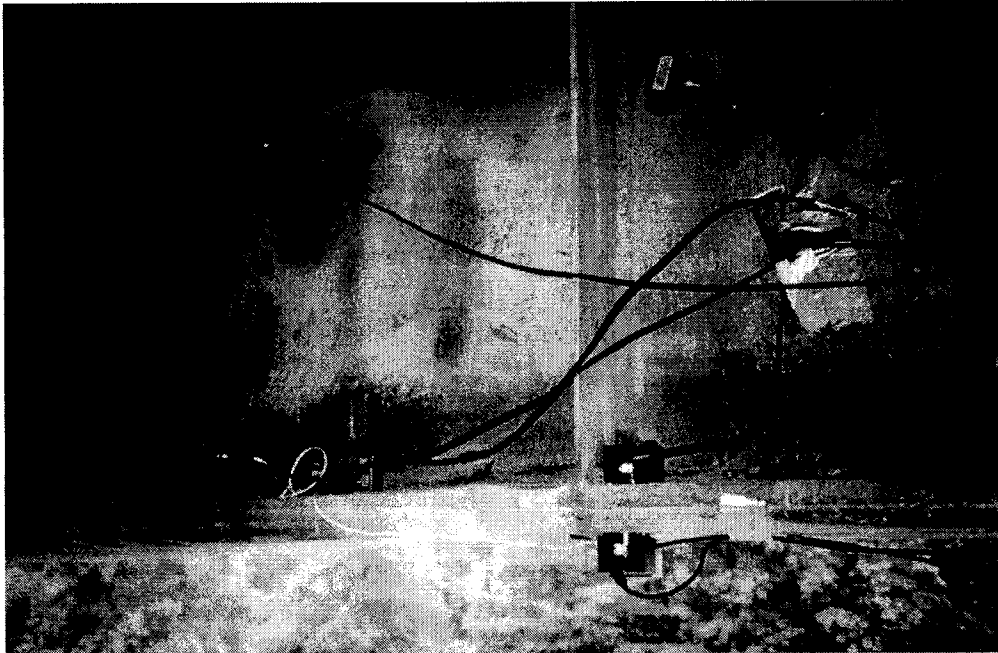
View of repaired girder showing location of sensors 3 and 4, positioned for source location to monitor lower flange-to-web weld, and guard sensors 5 and 6.
